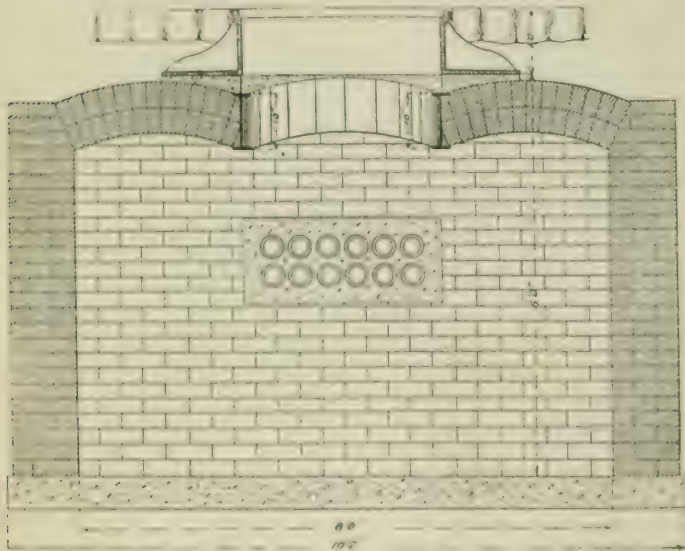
MANHOLE WITH ARCHED ROOF.
